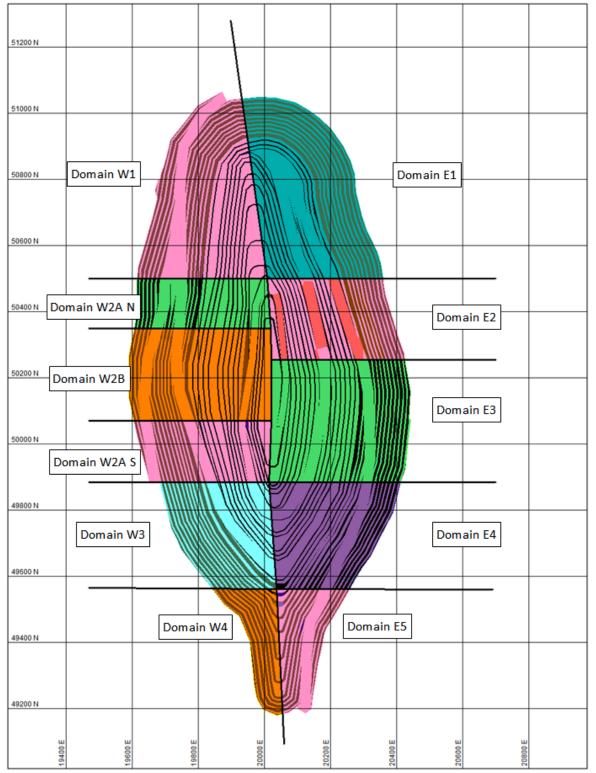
Plan View Showing Geotechnical Domains on the Final Pit Design
